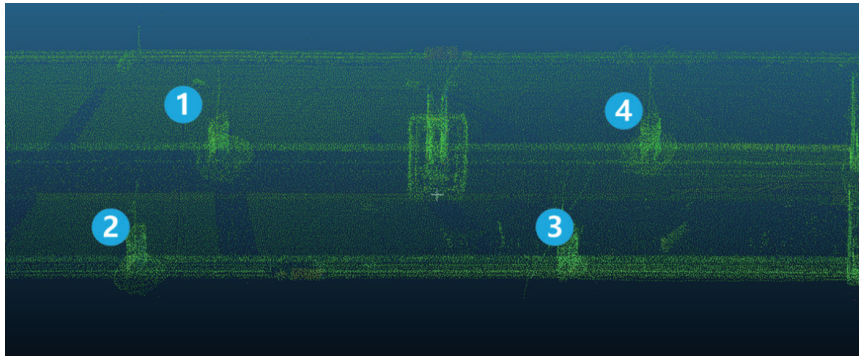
(Color online) Beishatan bridge pier numbering result.
